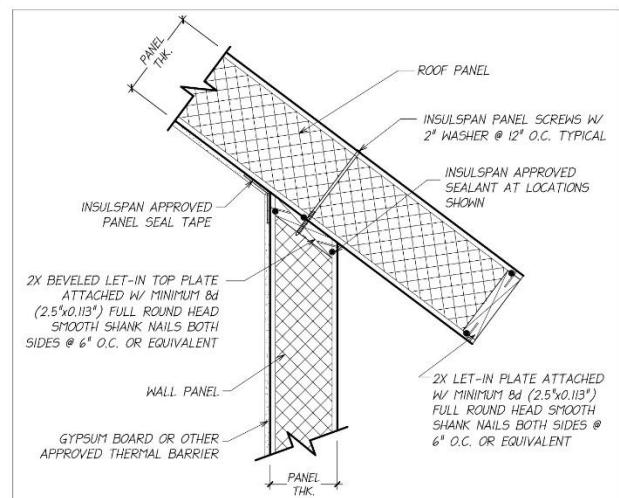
SIP Wall and SIP Roof Connection. Source: Insulspan
